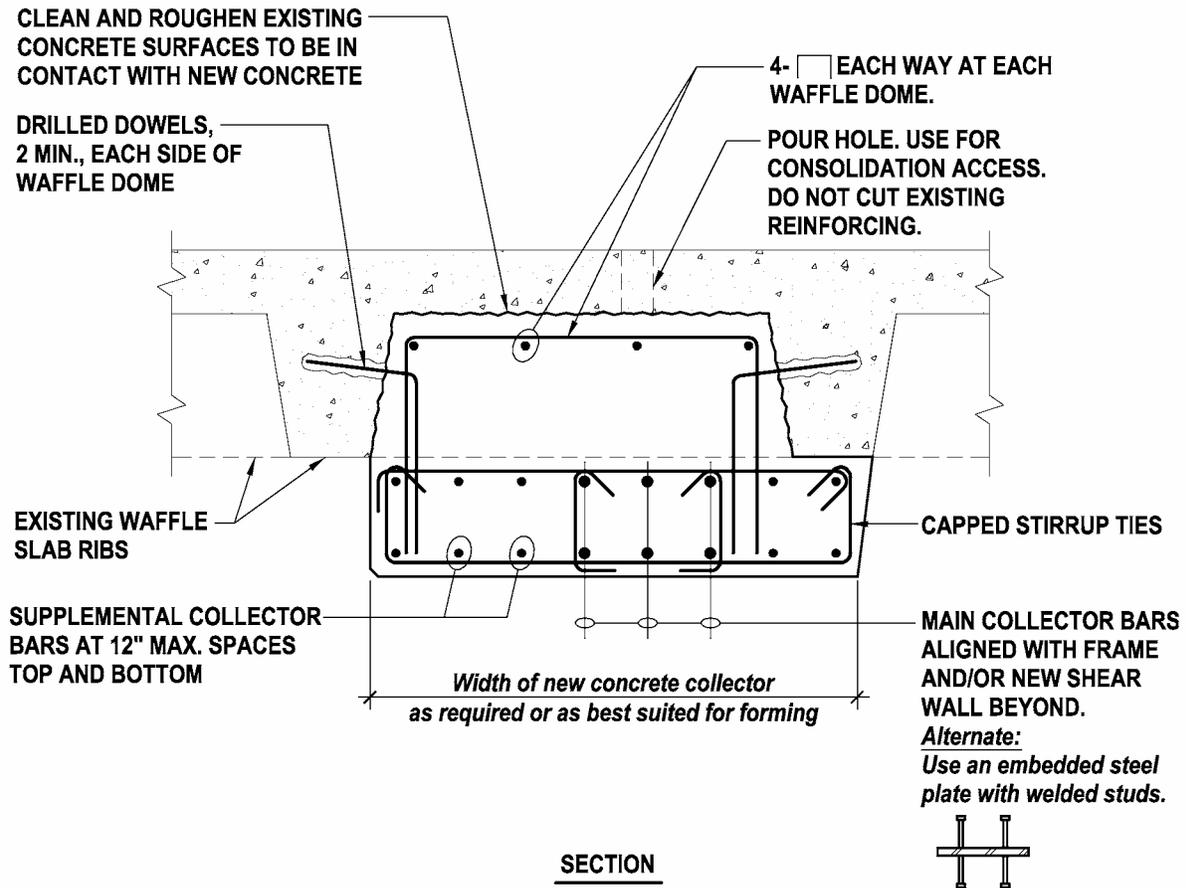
Concrete Collector at Waffle Slab
